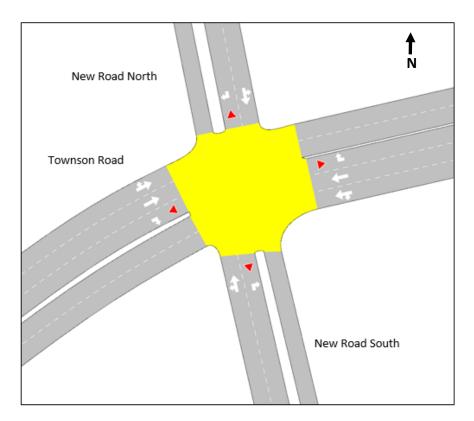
Modelled intersection layout at Townson Road and New Road
